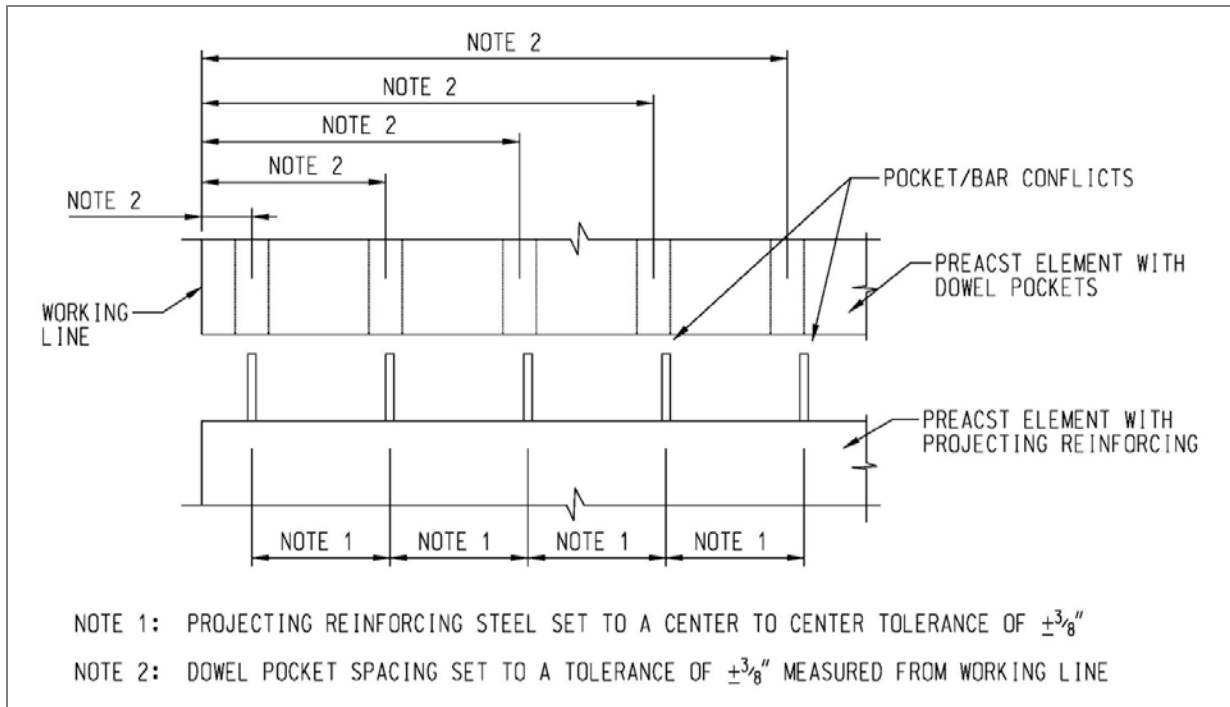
Example Element Tolerance Detail (Source: PCI Northeast).
